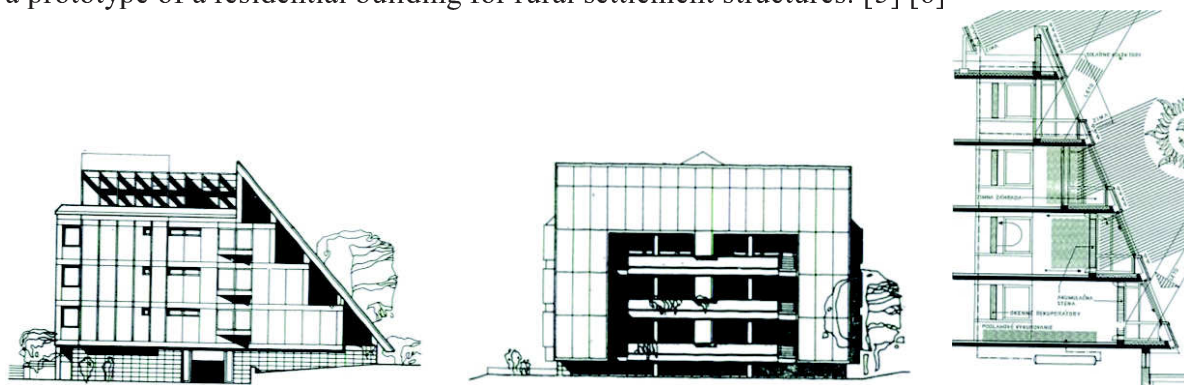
, Experimental apartment building in Holíč. [6] Western elevation, Southern elevation, Section. Architects L. Kušnir, M. Kiaček, B. Hnát, I. Kubík
